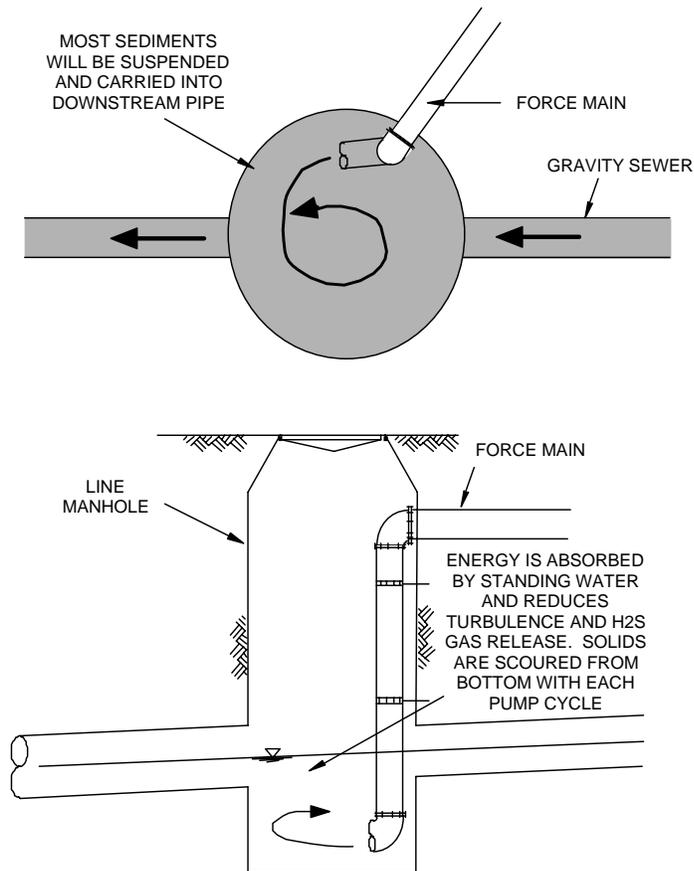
Force Main Line Manhole Turbulence Correction (Plan and Section Views)
